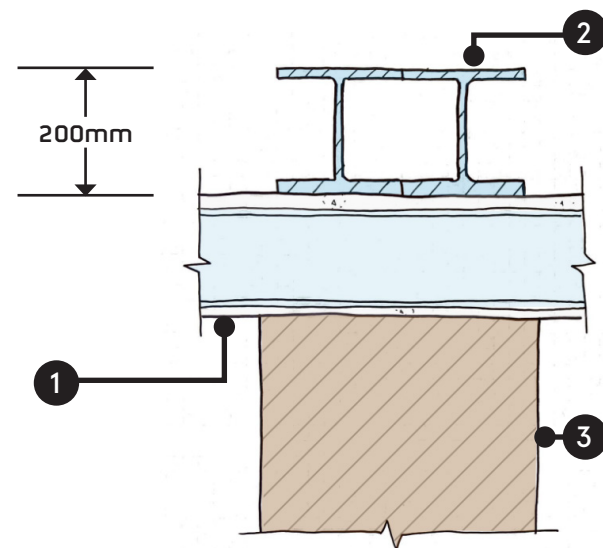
SECTION THROUGH PROPOSED SPREADER BEAM OPTION 1
